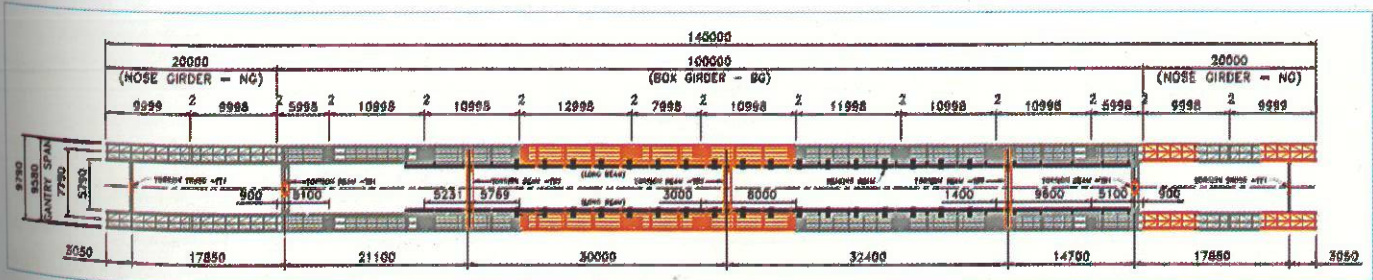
Plan of Launching Girder - Twin Truss of 7.79 m
